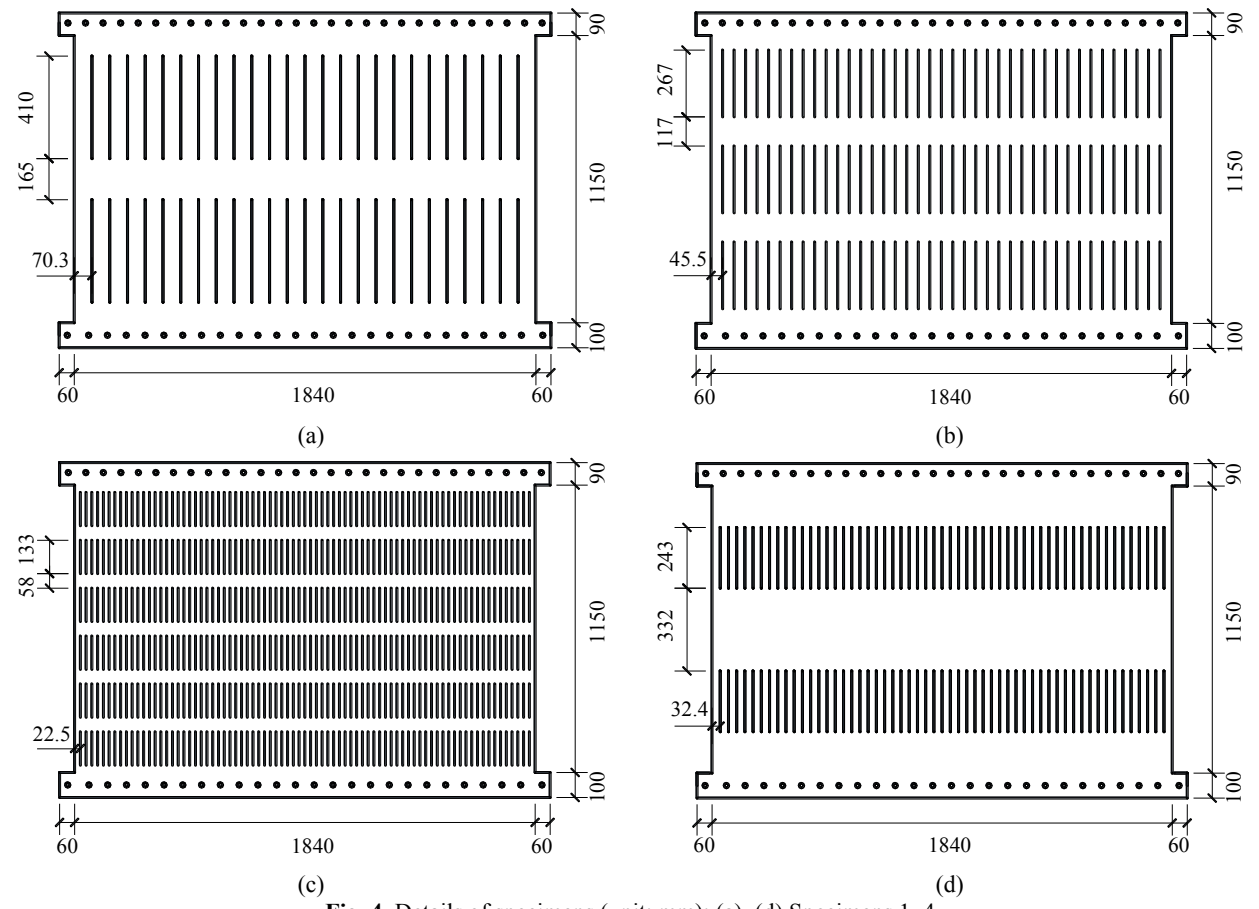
Details of specimens (unit: mm): (a)–(d) Specimens 1–4
